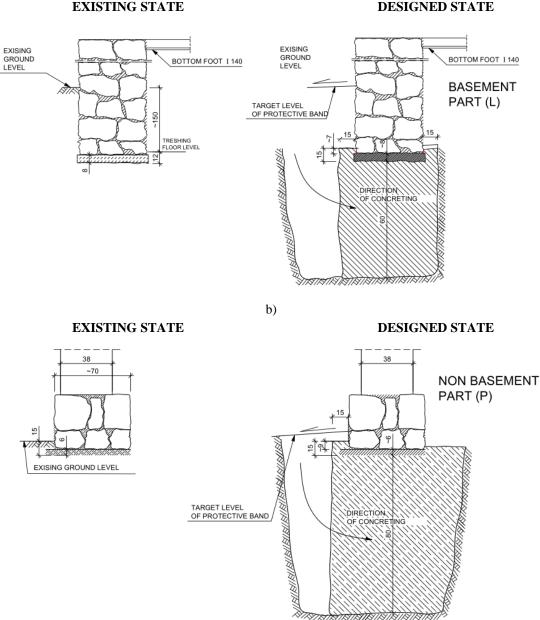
Details of reinforcement of the front, longitudinal wall (northern elevation) in a residential building: a) left side (L) (basement part), c) right side (R) (non-basement part)
